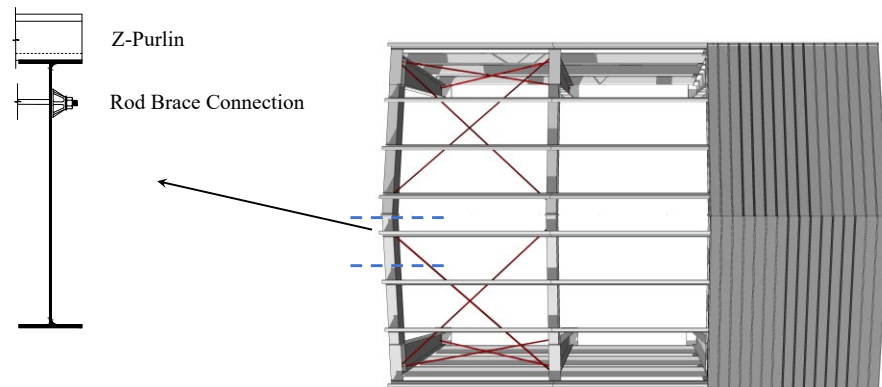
Application of rod bracing in metal building system: top view rod bracing detail
